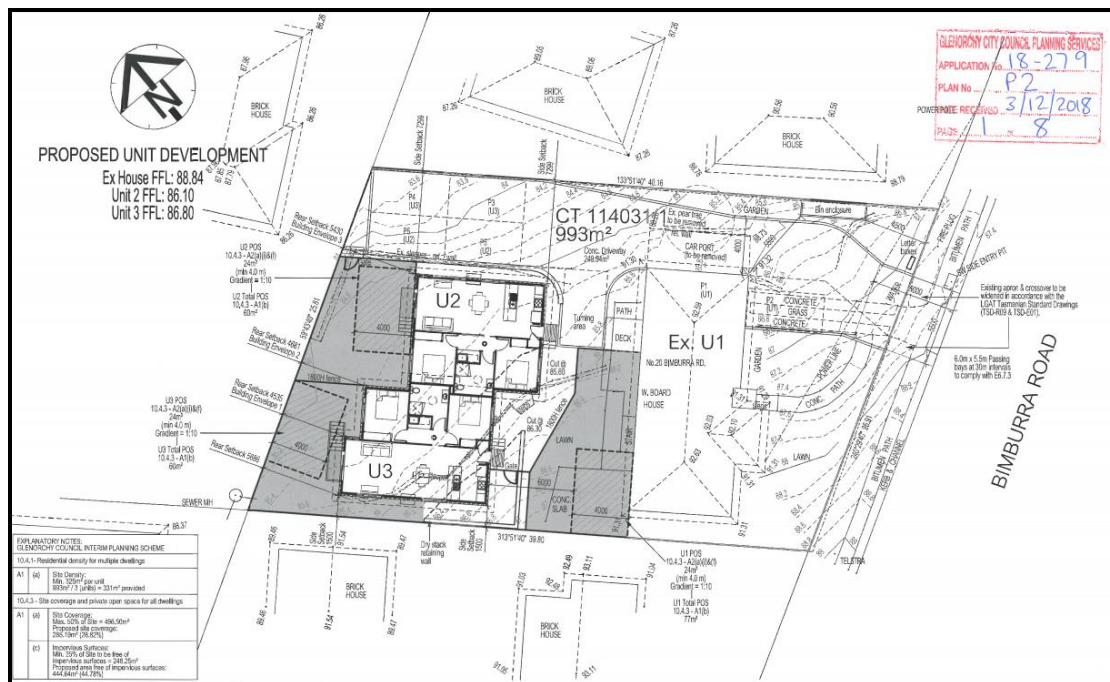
Site Plan for 20 Bimburra Road, Glenorchy.
